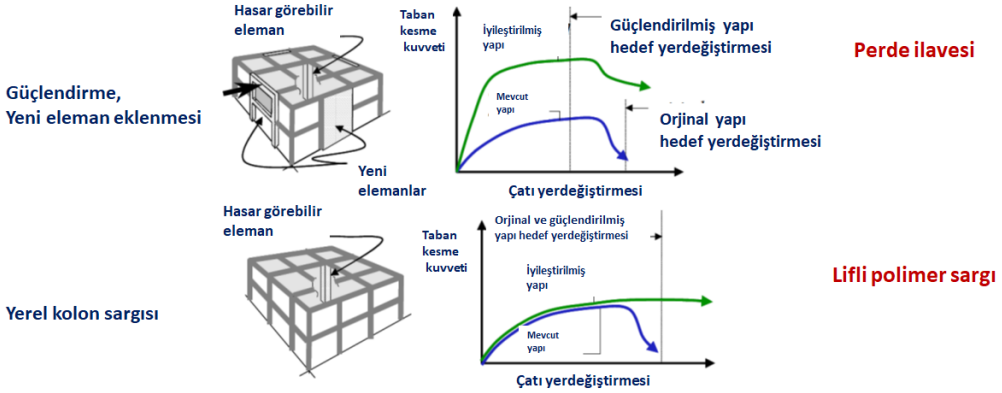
Strengthening Levels in Existing or Earthquake-Damaged Buildings, Including Stiffness Increase in the Structural System with the Addition of New Elements (Shear Walls and/or Frames), and Enhancement of Element Ductility with Local Column Wrapping (Fiber-Reinforced Polymer Wrapping) (Thermou and Elnashai, 2006) Mezzanine Arrangements, in Kahramanmaraş After the Earthquake
